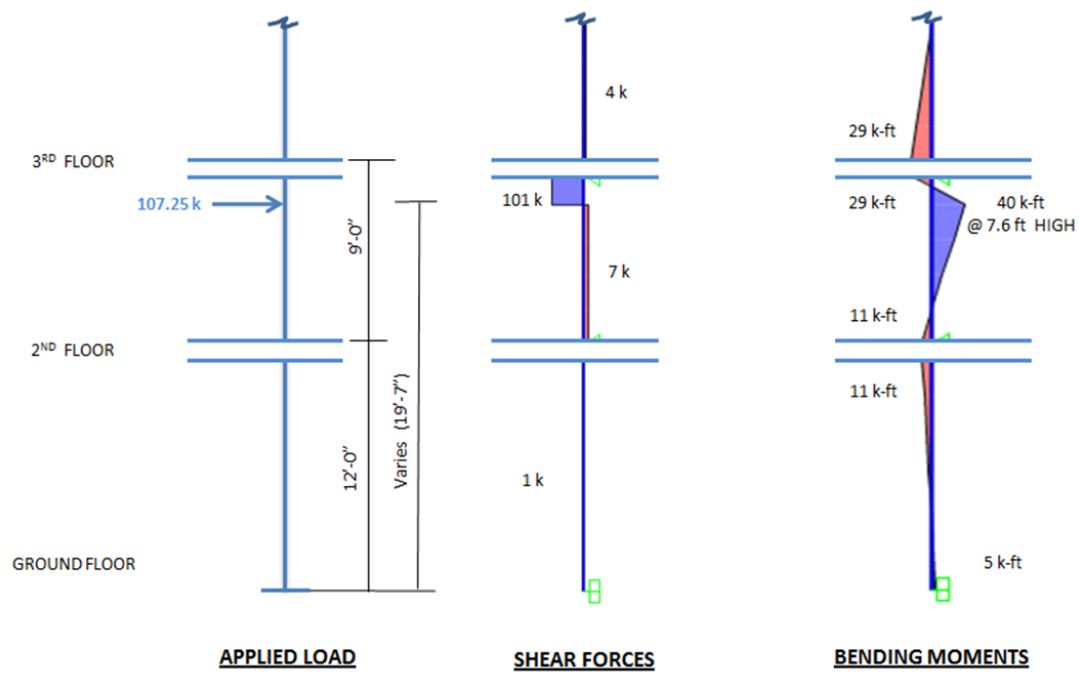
Impact load applied at d away from the end of column on the 2nd floor
